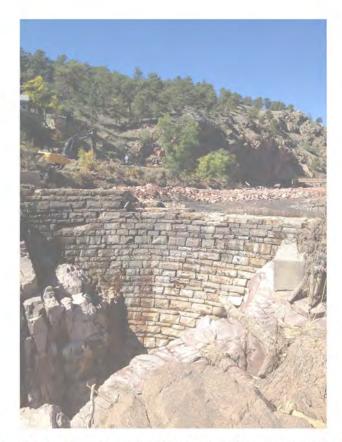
DAMAGE TO BIG DAM (LOOKING UPSTREAM)
